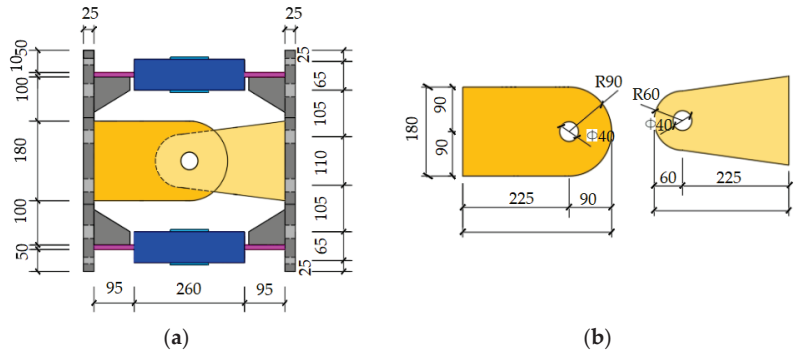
(a) Front view of the energy-dissipating steel hinge; (b) front view of the web mechanical hinge (unit: mm).
